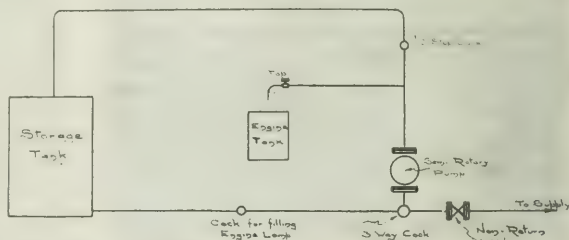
ARRANGEMENT OF OIL STORAGE TANKS, PUMP, AND PIPING.
